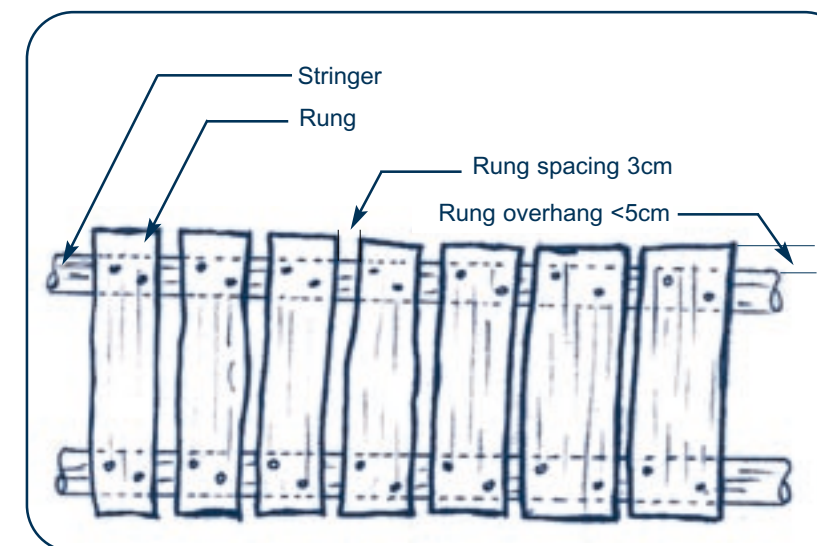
BRIDGE RUNG SPACING, RUNG OVERHANG
